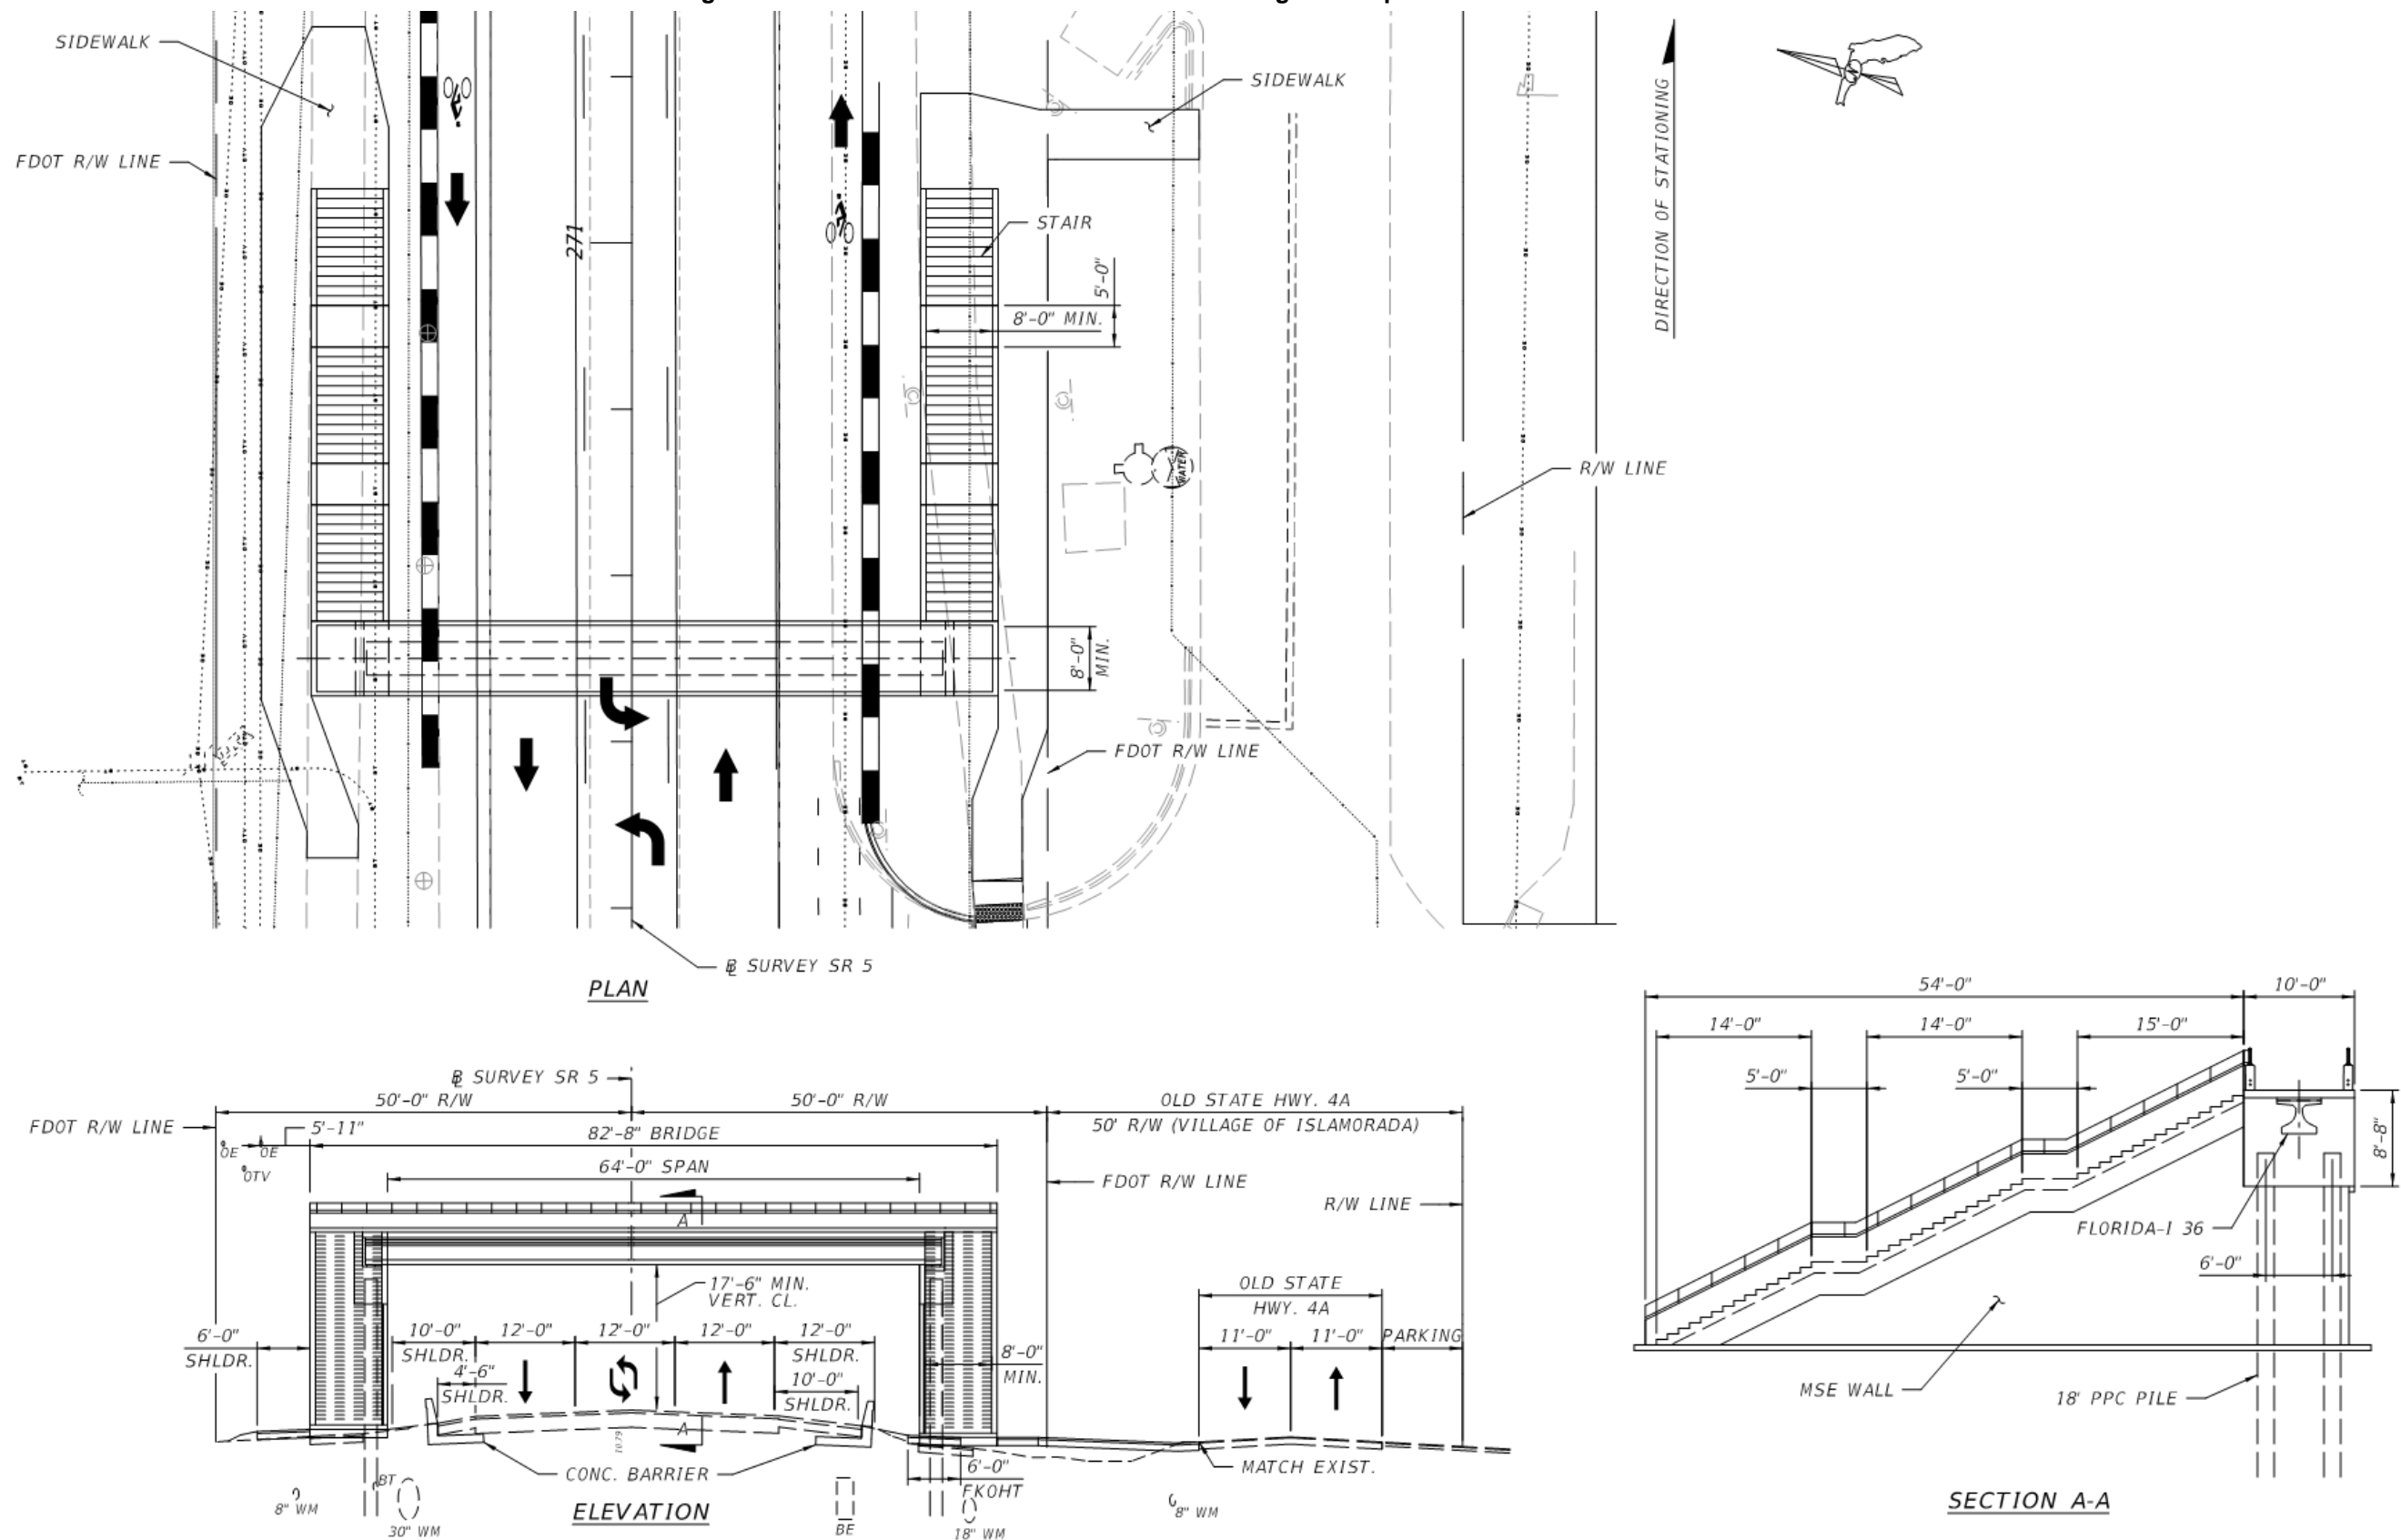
Location 4 Permanent Pedestrian Bridge Concept – Structural Plan & Elevation
